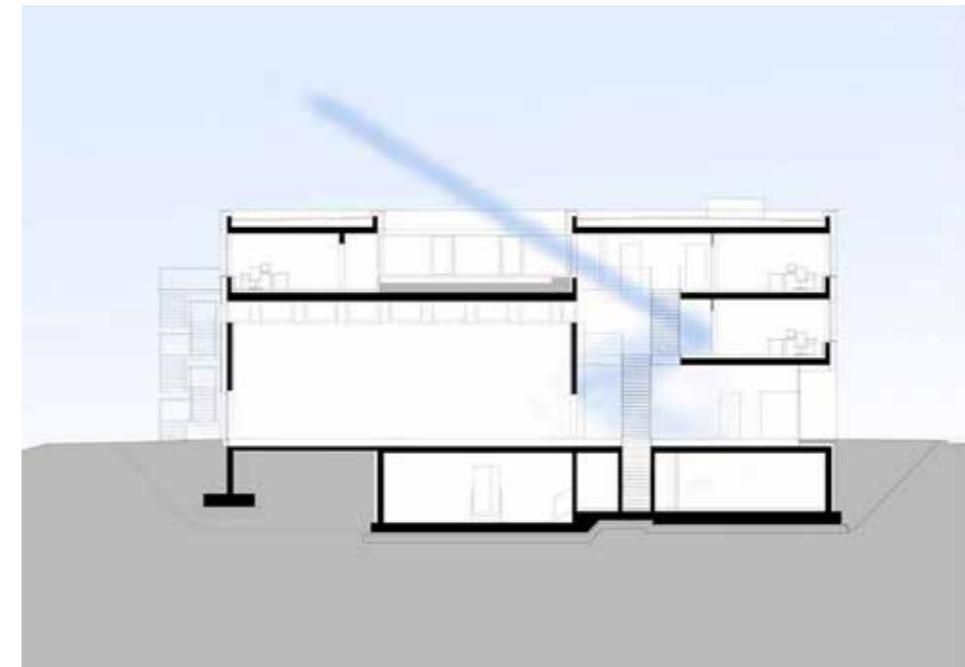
and Figure 33 RC inner wall and floor slab as a storage mass, Holiday Resort „Inselwelt“, Georg W. Reinberg, Jois
